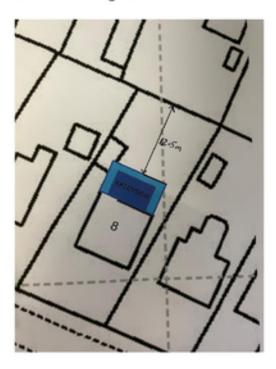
Proposed Block Plan – 12.5m separation distance between extension and adjoining property to rear
